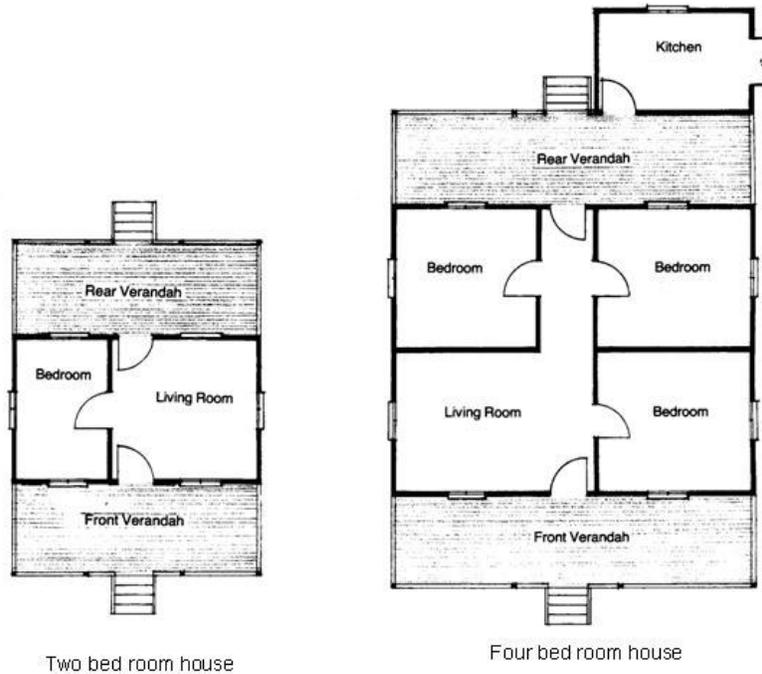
The two-roomed & four-roomed house plans (Saini, B. and Joyce, R., 1982, p.13)
